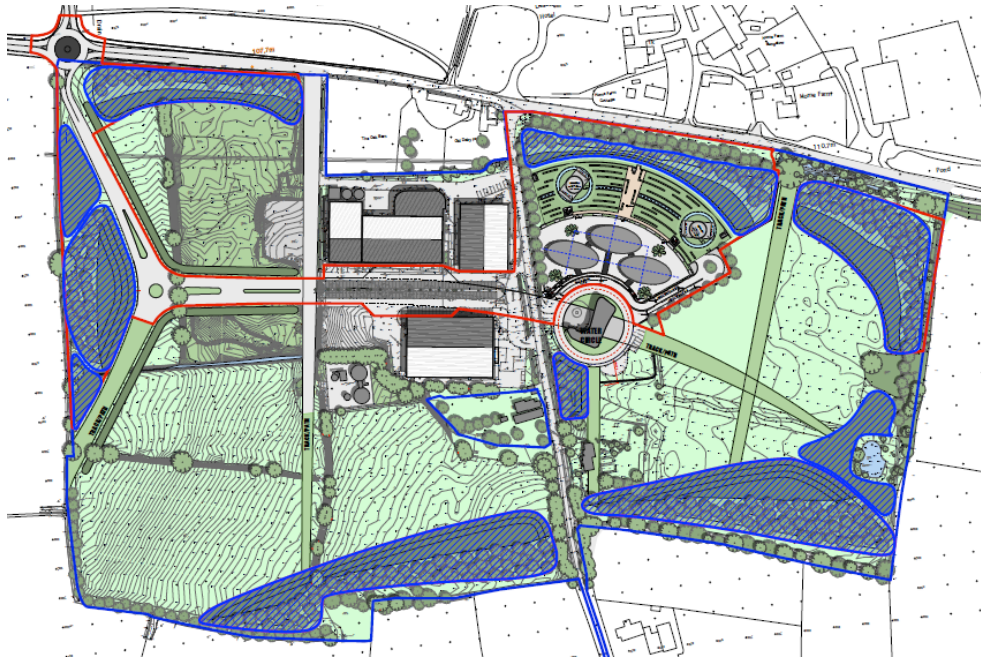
Proposed illustrative masterplan (ref: UTT/25/2027/OP)
